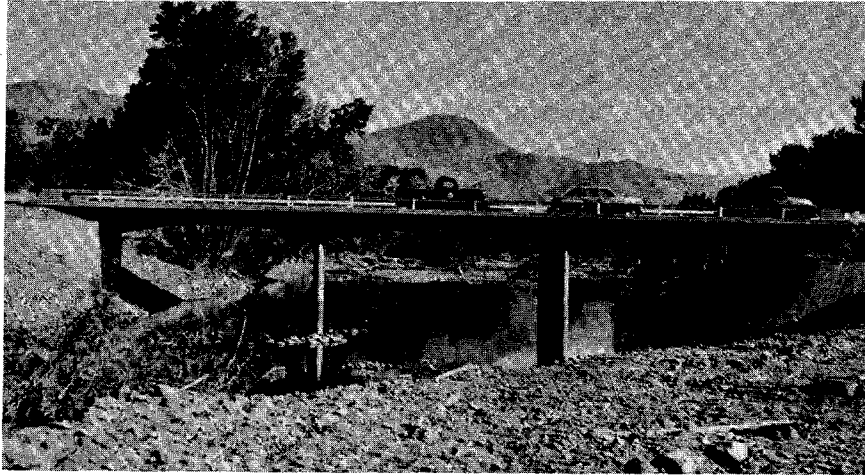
Abutment protection at bridge built in 1951. (From Nevada Dept. of Highways.)
